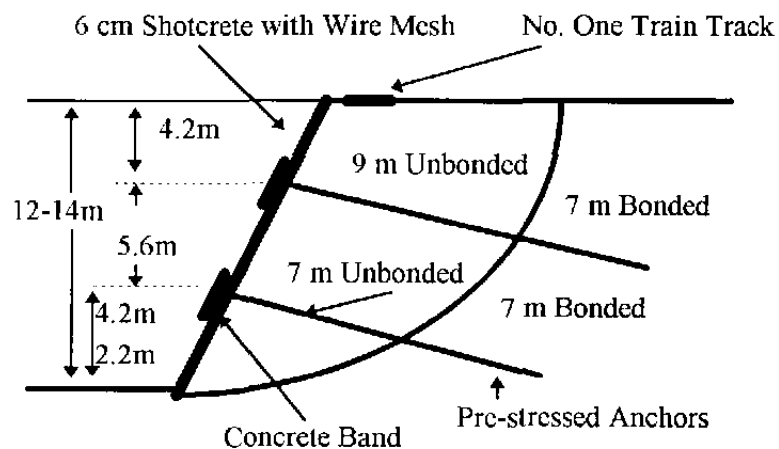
Cross Section of the Planned Bracing (Not To Scale)
